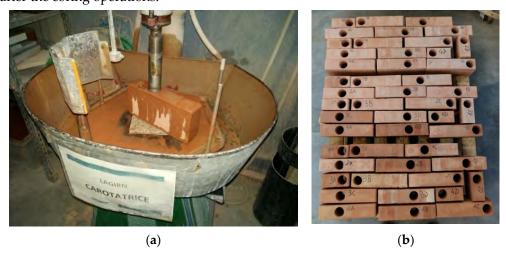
Preparatory stages for laying bricks: (a) core drilling of a brick; (b) drying of bricks after core drilling:
